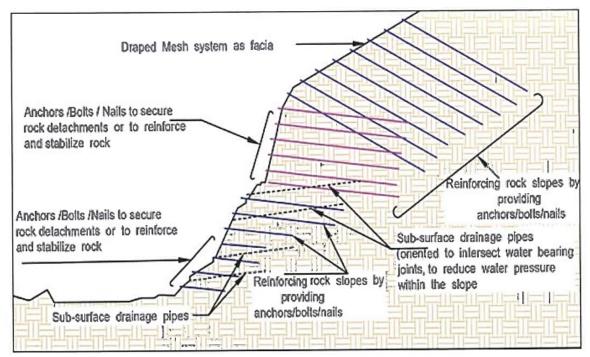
Typical Cross-section of Reinforcing Rock slope by Anchos/Bolts/Nails
